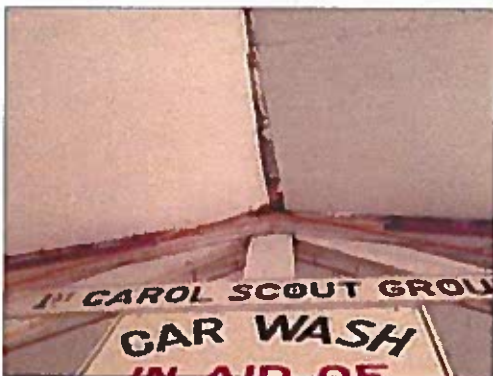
View of damaged plywood ceiling of upstairs equipment room.
